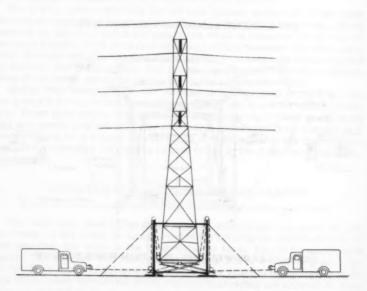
TOWER RAISED ABOUT 4 FT ABOVE GRADE
